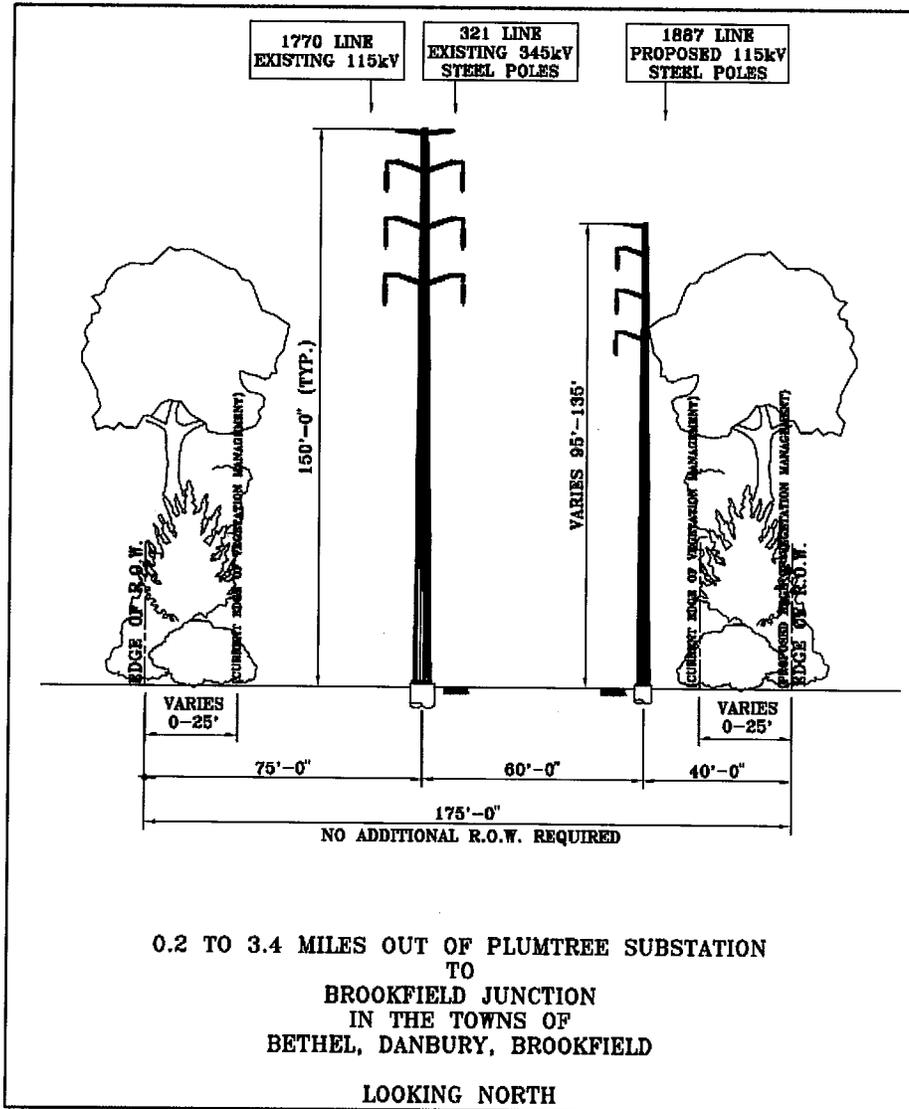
Cross section of the existing right-of-way with the new transmission line, adjacent to Plumtree Substation.
